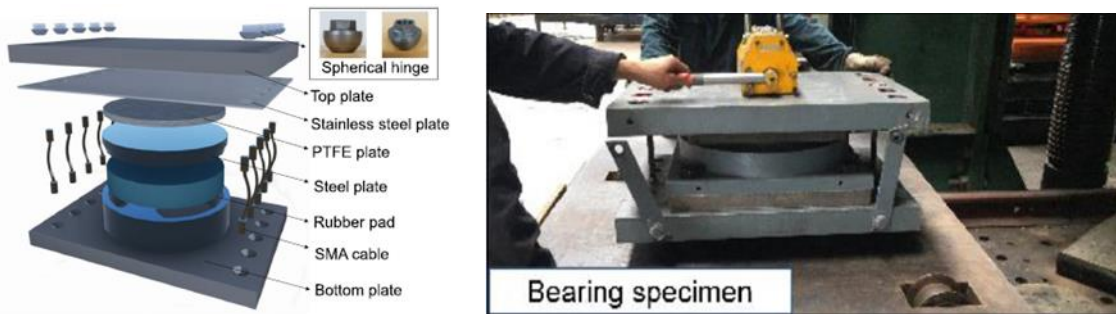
Three-dimensional schematic illustration and photograph of SMA-sliding bearing [200]
